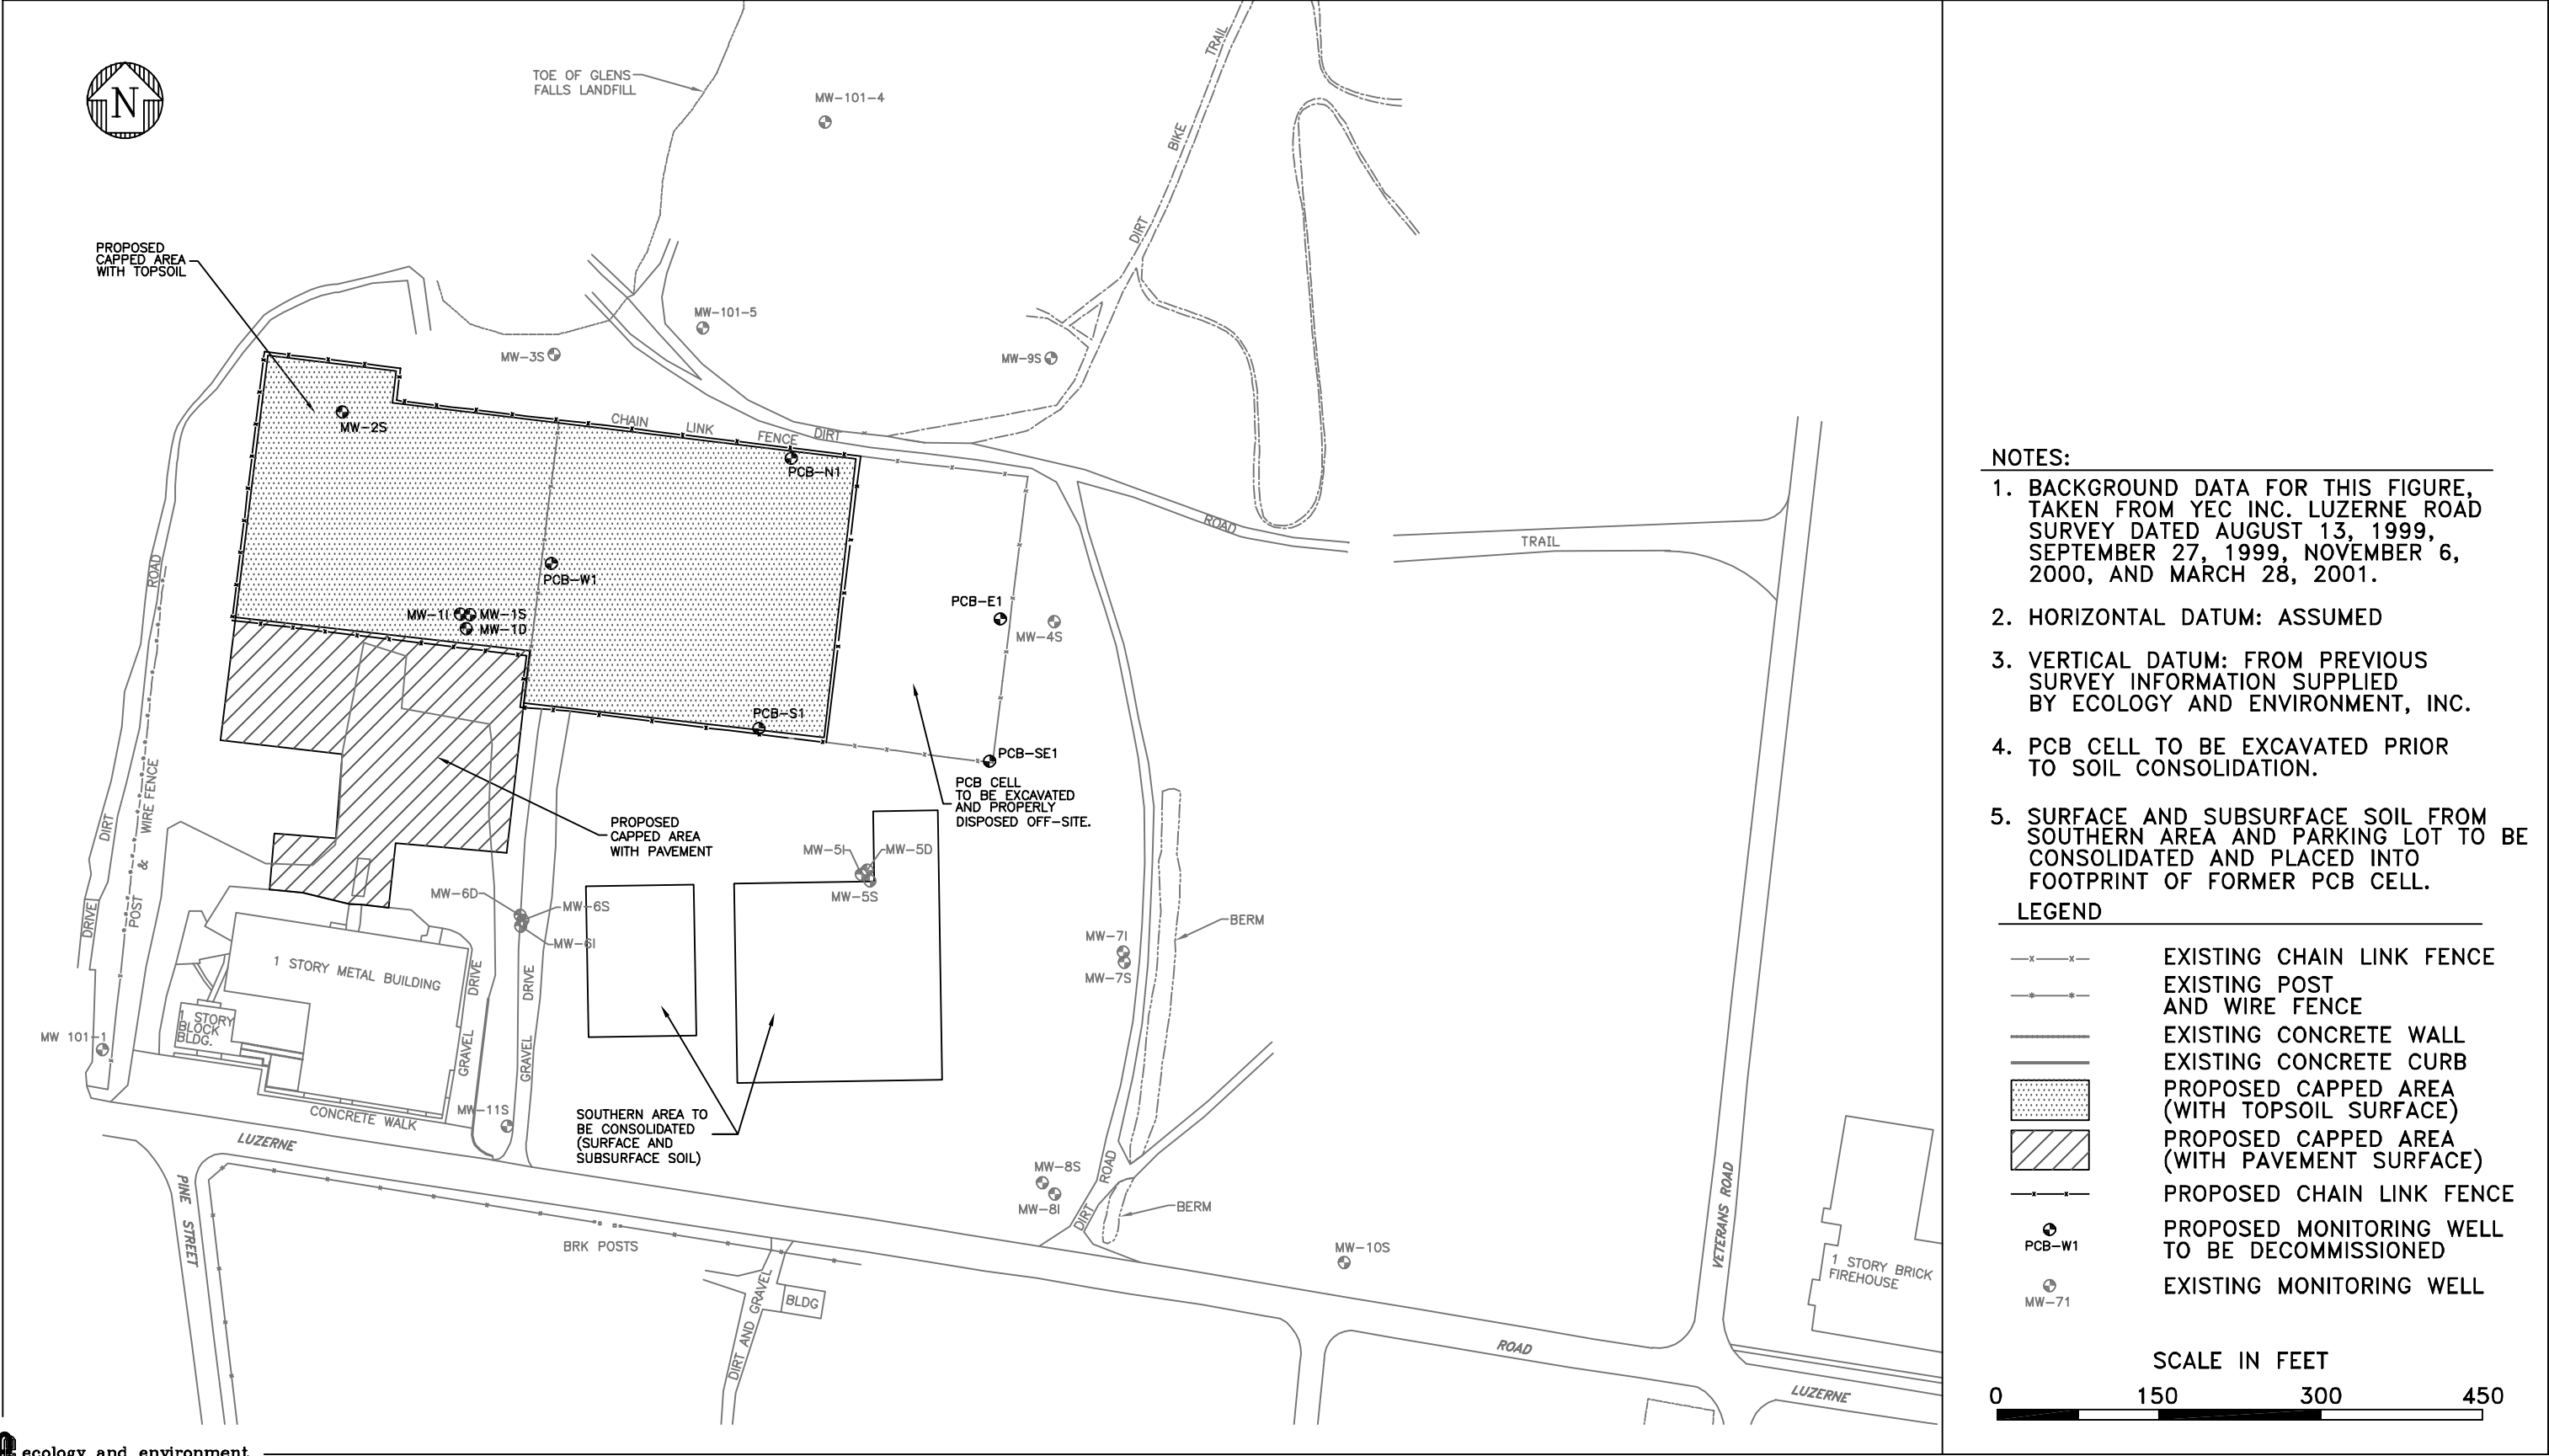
ALTERNATIVE 2 – SOURCE AREA CAPPING & EXCAVATION & OFF-SITE DISPOSAL OF PCB CELL LUZERNE ROAD SITE QUEENSBURY, NEW YORK
